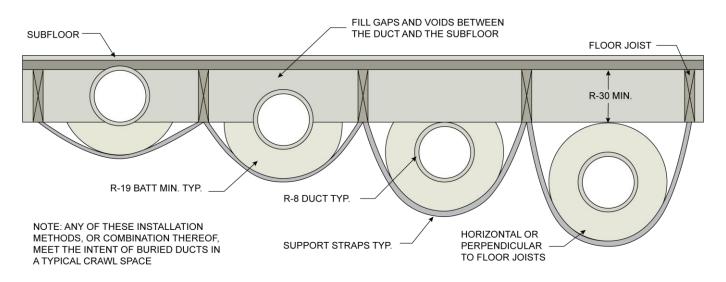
When in a vented under-floor space, batt insulation may be used to achieve the R-19 insulation level around the entire surface area of the duct *not in contact* with the required R-30 floor insulation. Floor insulation shall be installed to fill any gaps and voids between the duct and the floor. Depth marker flags are not required as long as the additional batt insulation is clearly marked as R-19 and there is minimal compression of the batt by support straps or other material.
